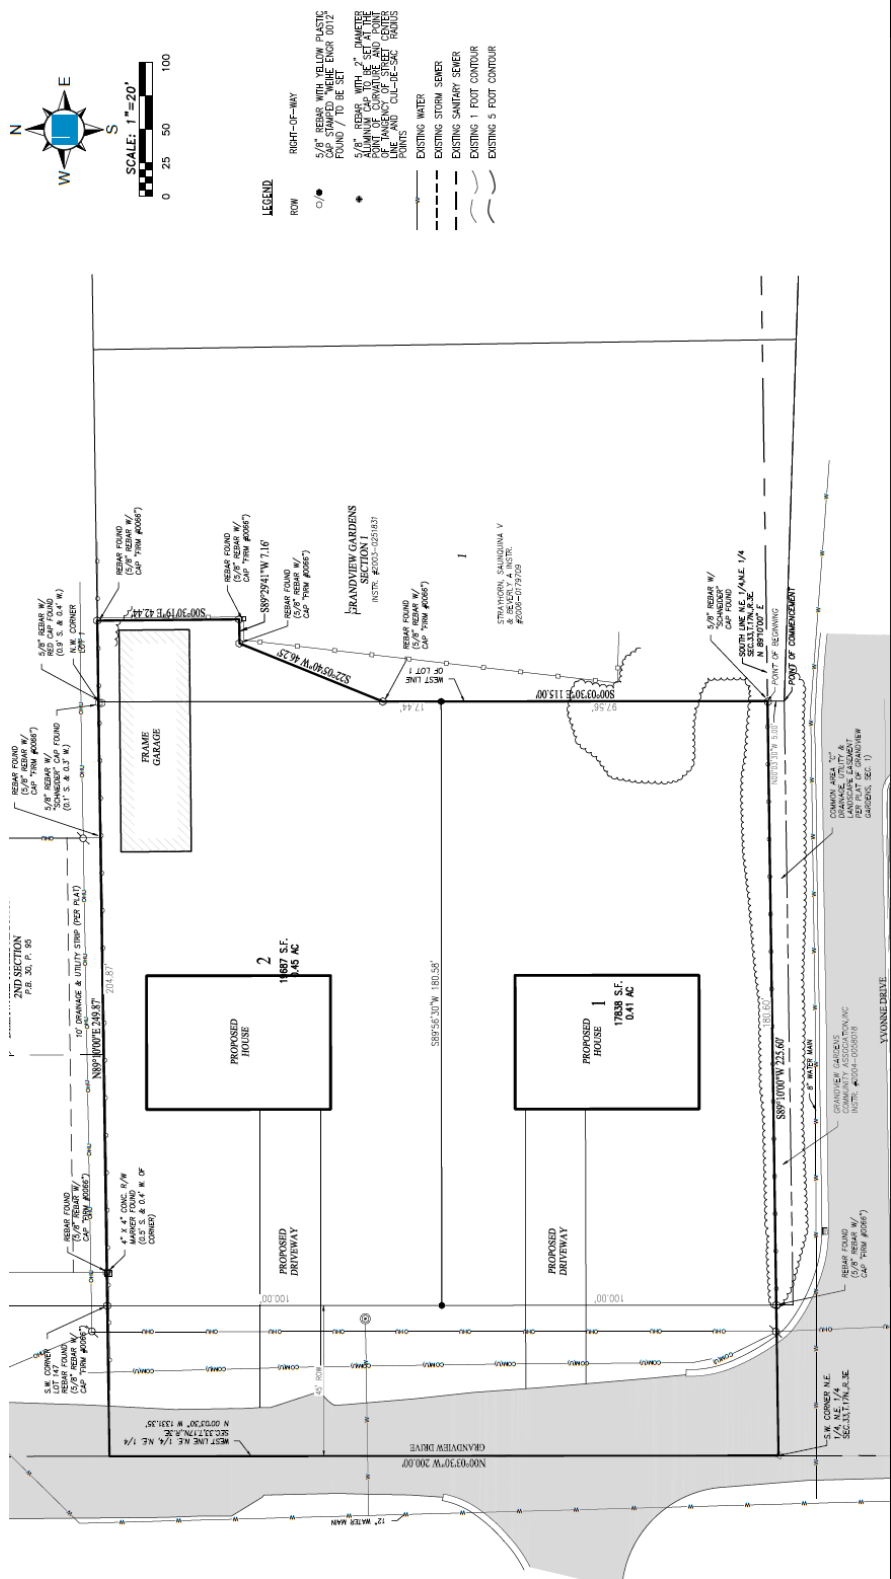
Proposed single-family structures to be built on the newly created parcels if approved.
